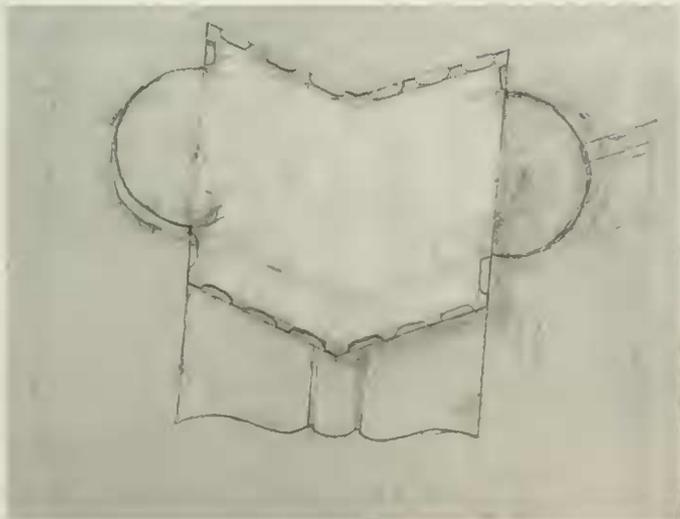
Sketch of a detail from Brunelleschi's Lantern of Santa Maria del Fiore (completed 1472). (Author).
